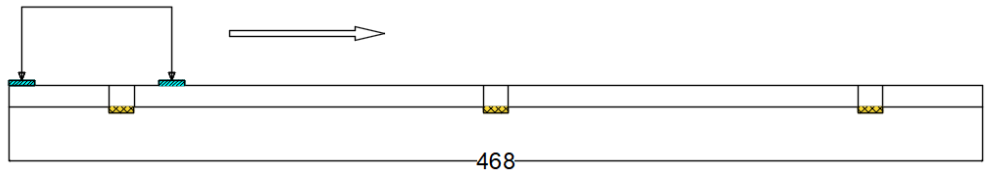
The placement of HL-93 load on the deck slab with 15 ft girder spacing (with two cells) (first combination)
